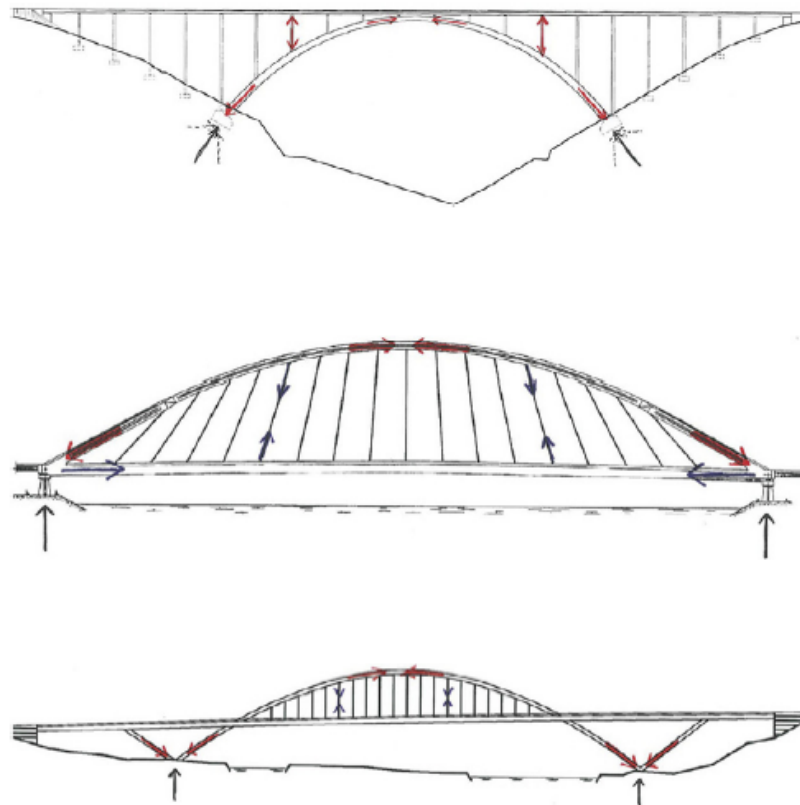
Arch bridges classified by position of the deck including flow of forces, (a) deck arch bridge, (b) through arch bridge, (c) half-through arch bridge [16]
